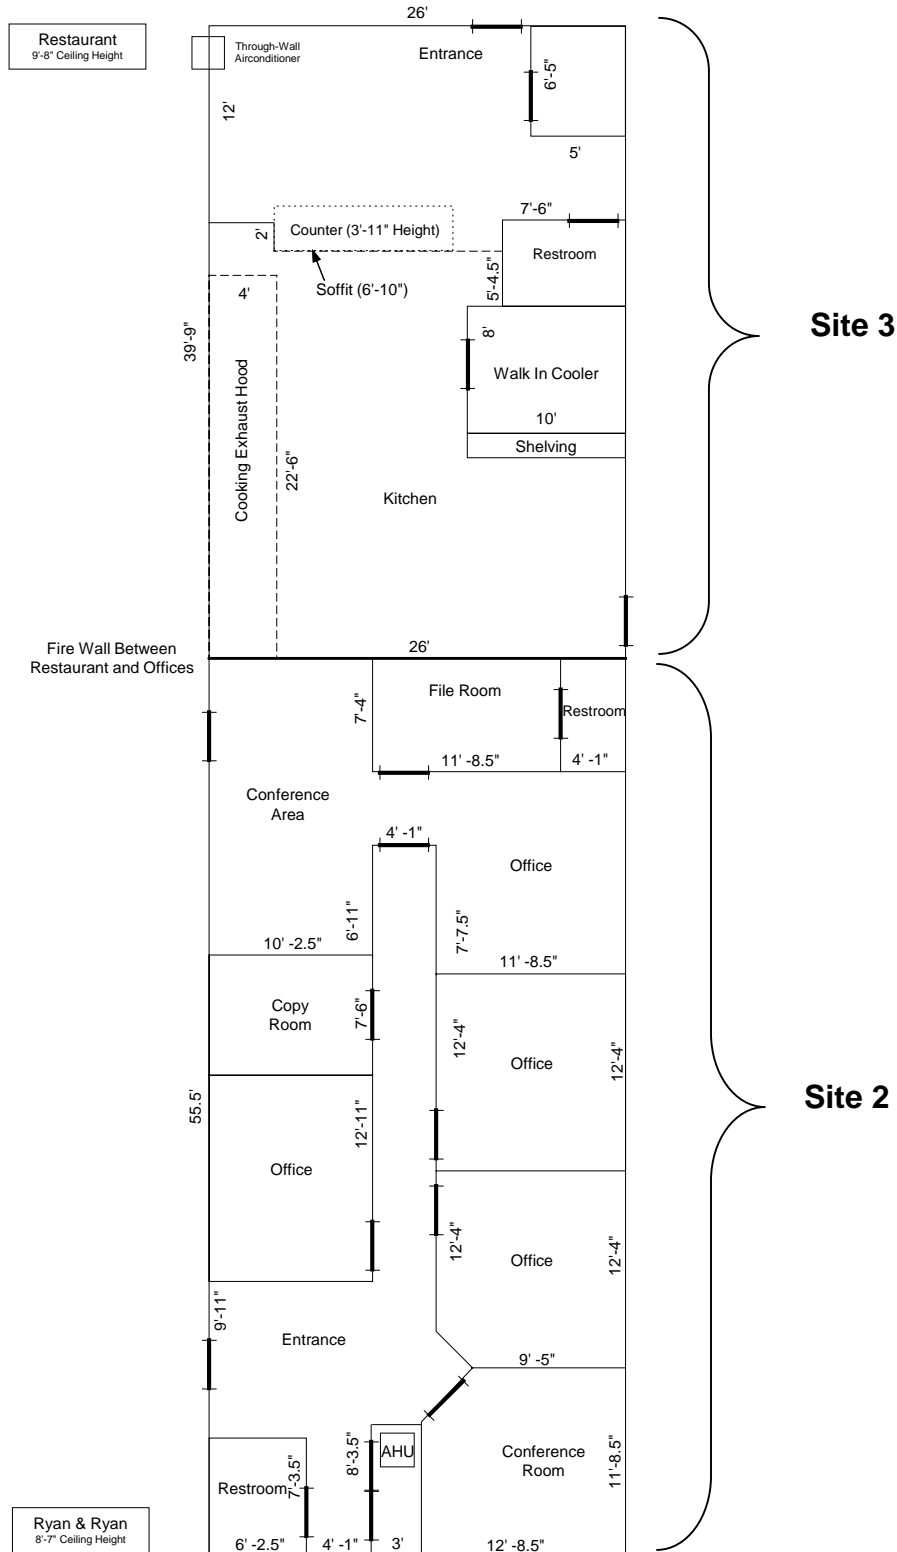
Facility Floor Plan, Showing the Office (Site 2) and the Restaurant (Site 3)
